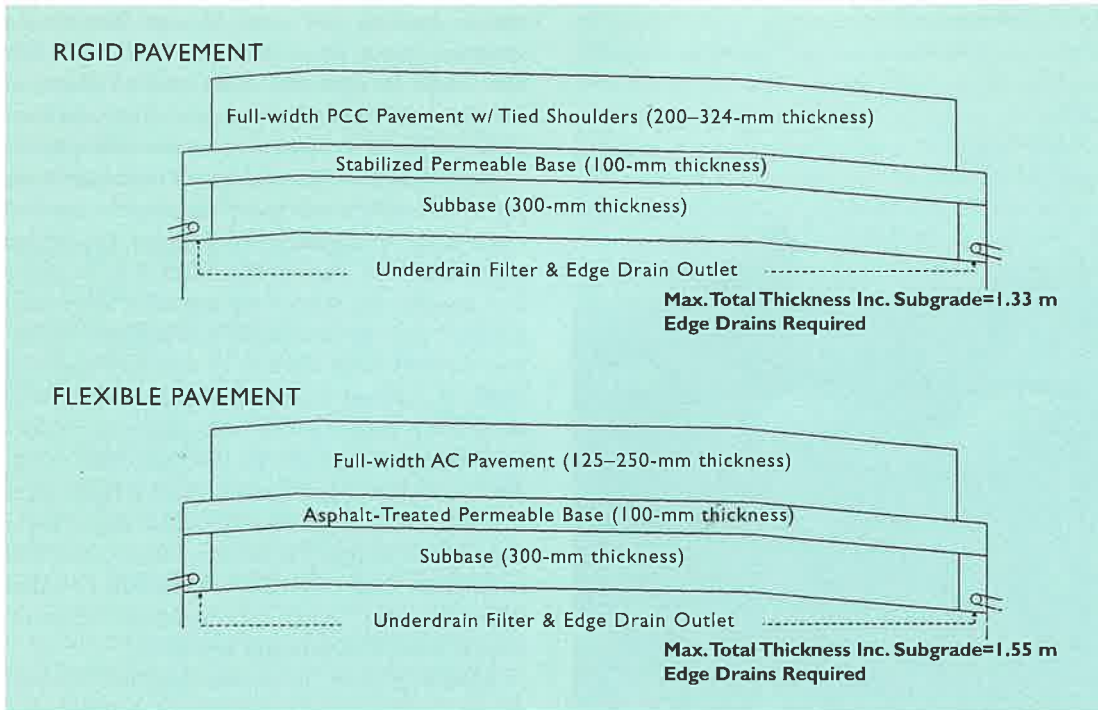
Typical pavement cross sections (not drawn to scale).
